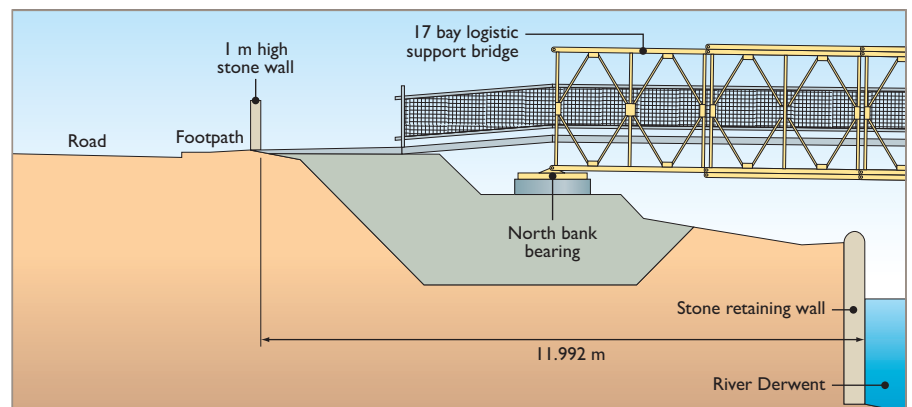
Cross-section of the northern abutment, where there was just 12 m between the existing river retaining wall and roadway
